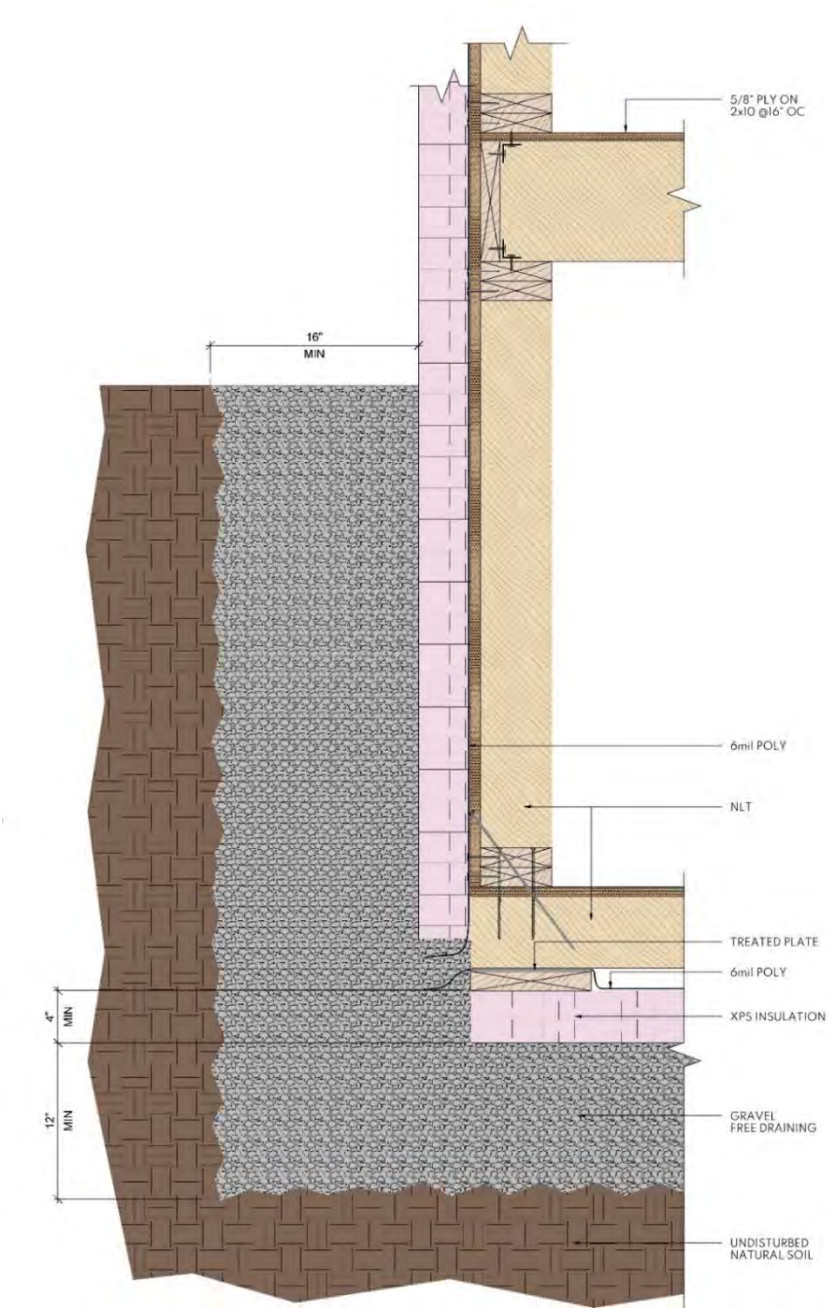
MT NLT Slab and wall interior load-bearing wall detail for Crawlspace Buildings.
